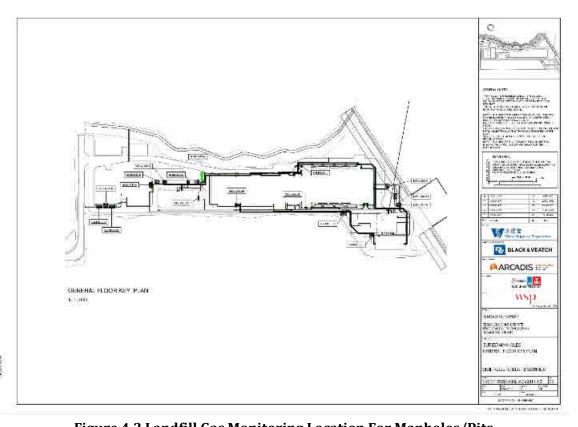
Landfill Gas Monitoring Location For Manholes/Pits
